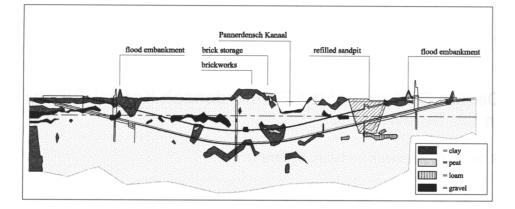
Geological condition of railway tunnel(Tunneling and Underground Space Technology)
